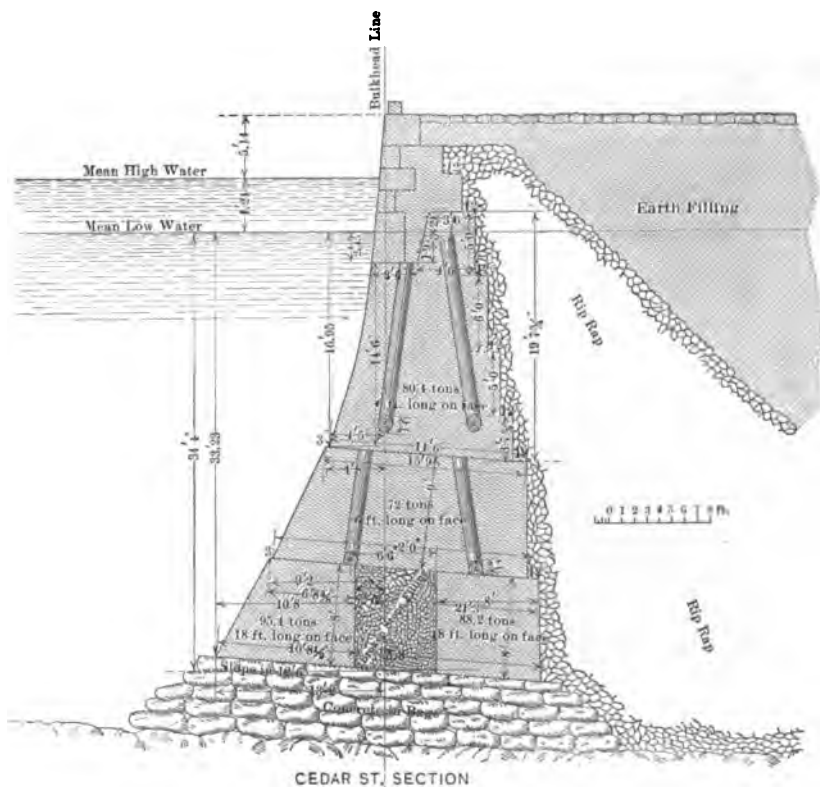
NEW YORK SEA WALL. CONCRETE BAGS ON ROCK.
